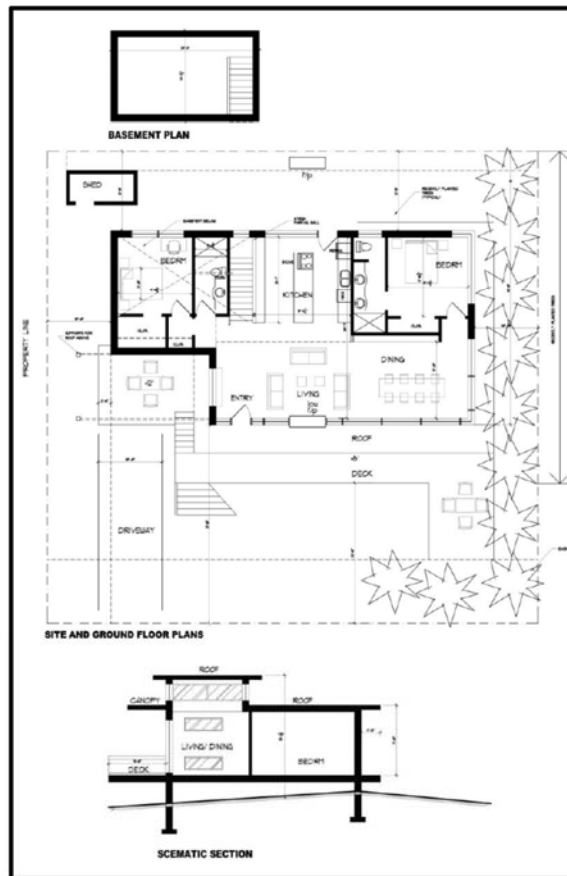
Proposed House Design, Site Plan, Floor Plan and Schematic Section, (Appendix I)
